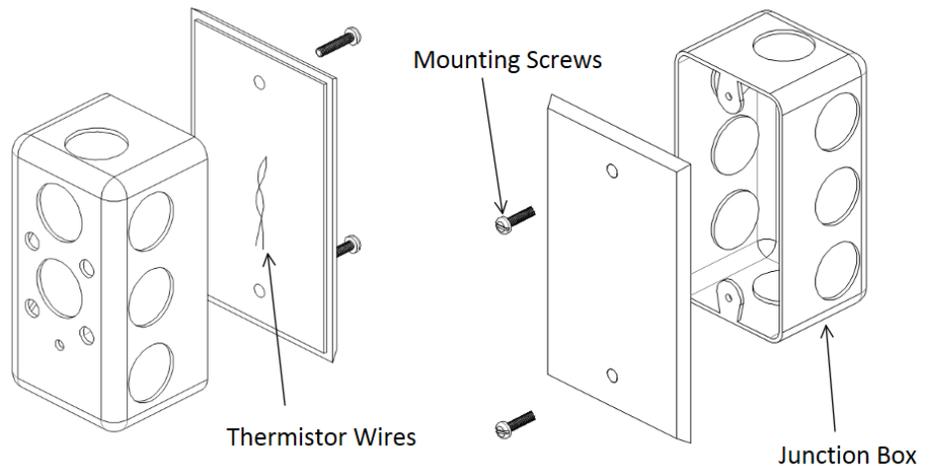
Space Thermistor Detail (Stainless Steel Housing Wall Mount)
